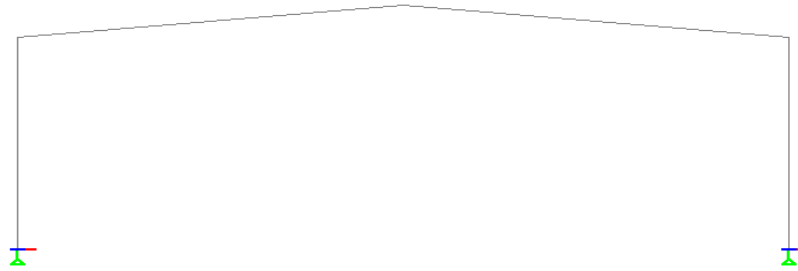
Model of pre-engineered steel frame on Staad. Pro V8i
